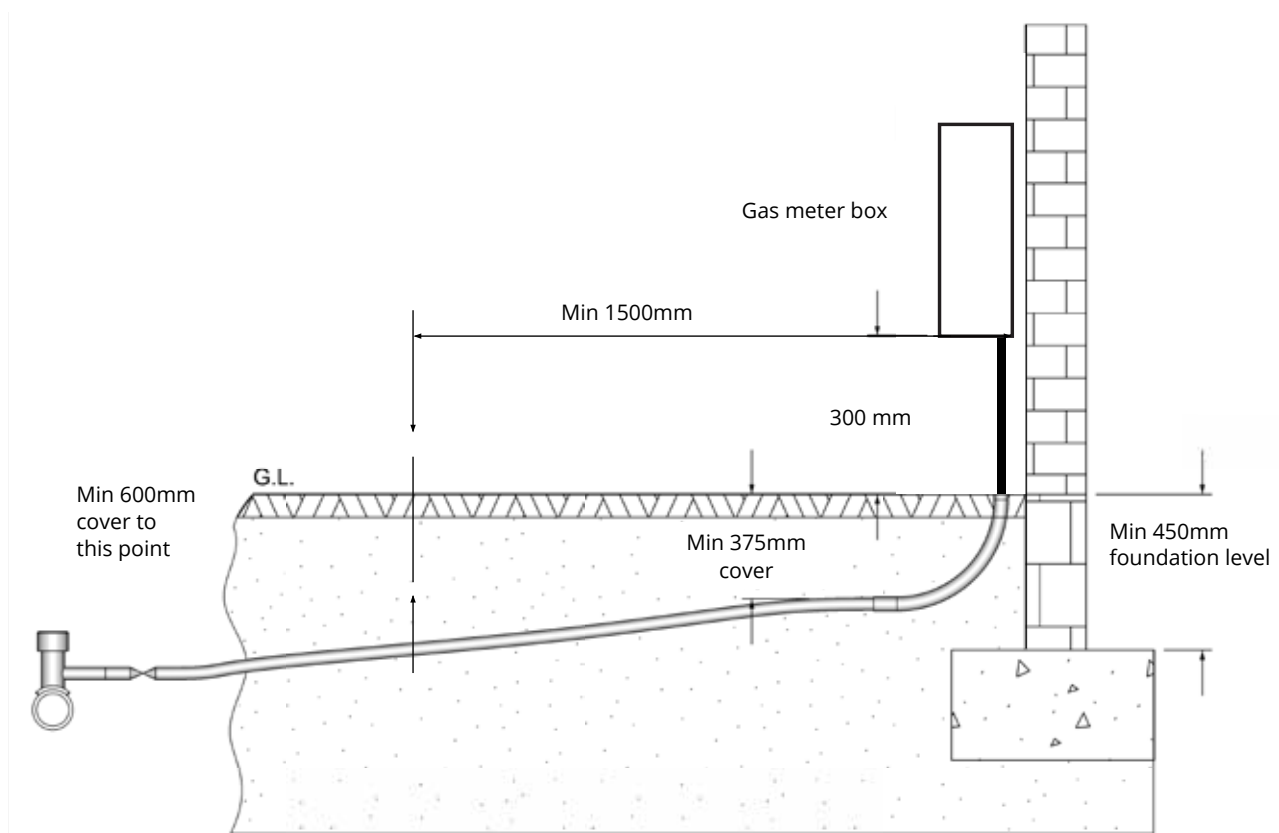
A minimum cover of 375mm and minimum foundation of 450mm are necessary
